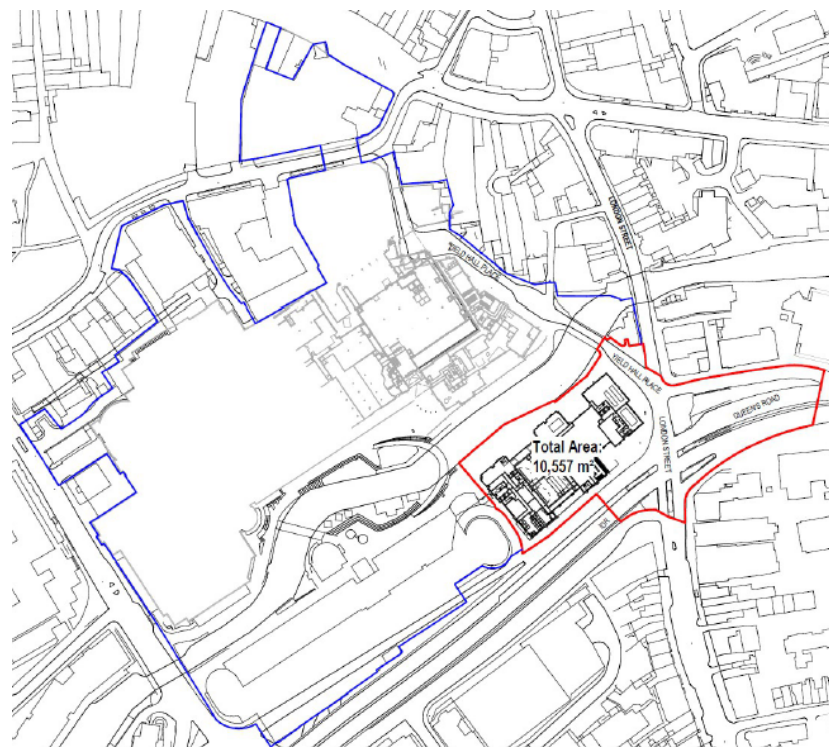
YHP2 (application ref. 22/1917) – Site Location Plan (redline area).
